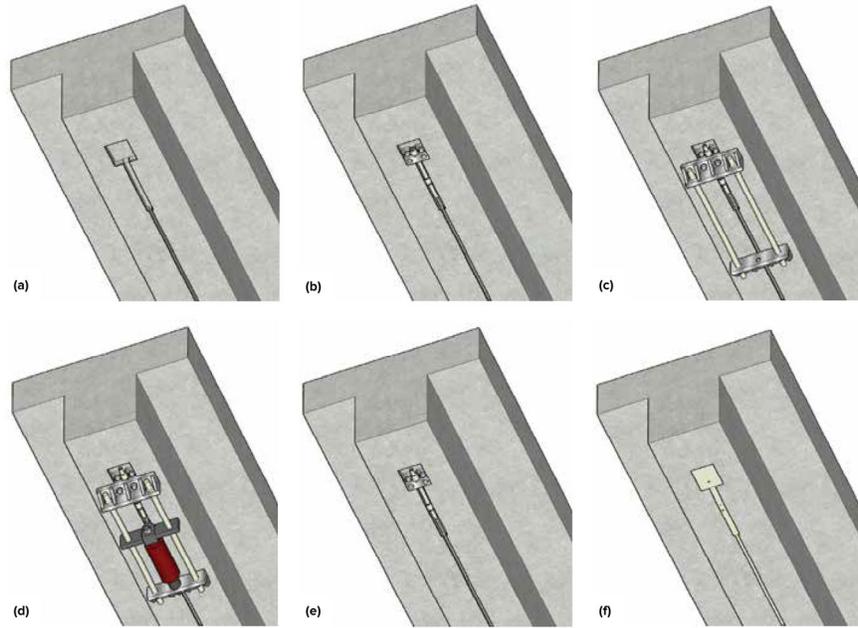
Strengthening scheme: (a) groove and anchorage zone are cut into the girder; (b) anchorage and CFRP rod are installed; (c) jacking apparatus is mounted; (d) post-tensioning force is applied to anchorage sleeve on the CFRP rod; (e) force is transferred from the jacking apparatus to a fastening nut on the end of the anchorage sleeve; and (f) the groove and anchorage zones are grouted [57]
